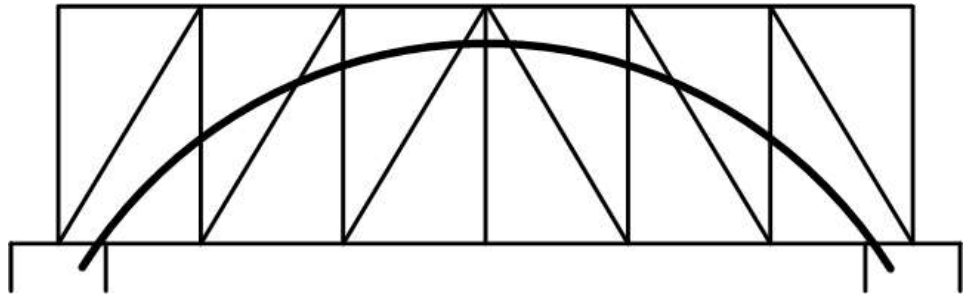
Schematic of Burr Arch-truss Covered Bridge
